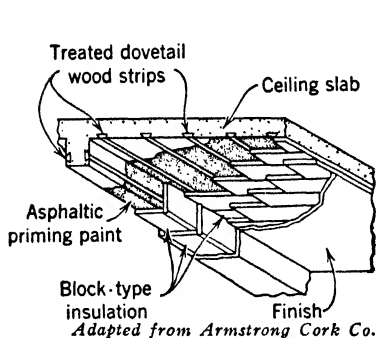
Block- or board-type insulation applied to a concrete ceiling. The dovetail wood strips are imbedded in the concrete in new ceilings. On old ceilings plain strips must be attached with suitable anchors. The blocks are bonded to the ceiling and to each other with hot asphalt. In addition, the first course is nailed to the strips. Wooden skewers are used to help hold the second course to the first.
